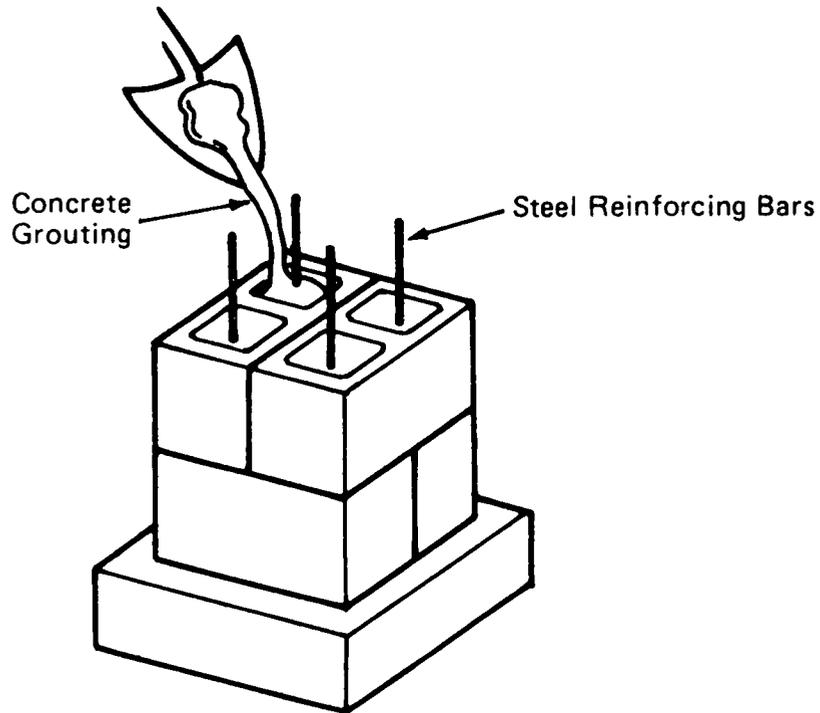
For piers exceeding 80 inches in height the concrete blocks must be filled with concrete grouting and steel reinforcing rods utilized.
